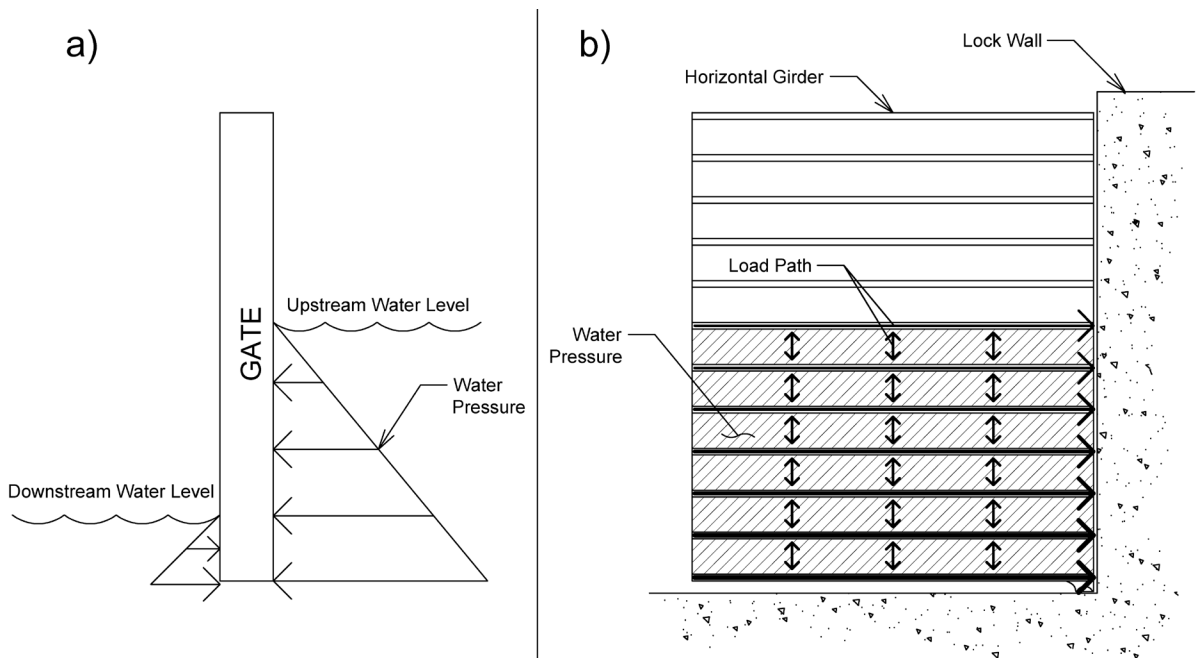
a) Load scenario for lock gate. b) Load transfer through girders to wall.
